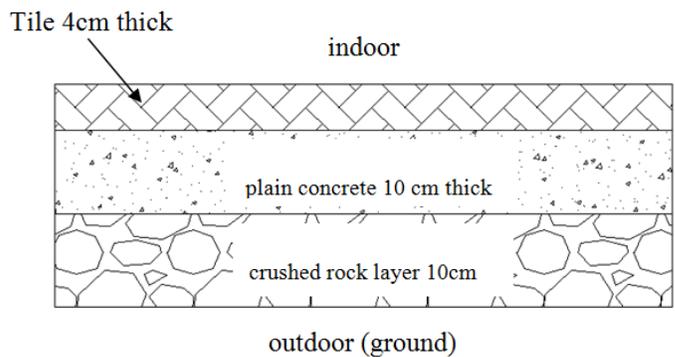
Section of the widely used floor of the buildings in Duhok City
